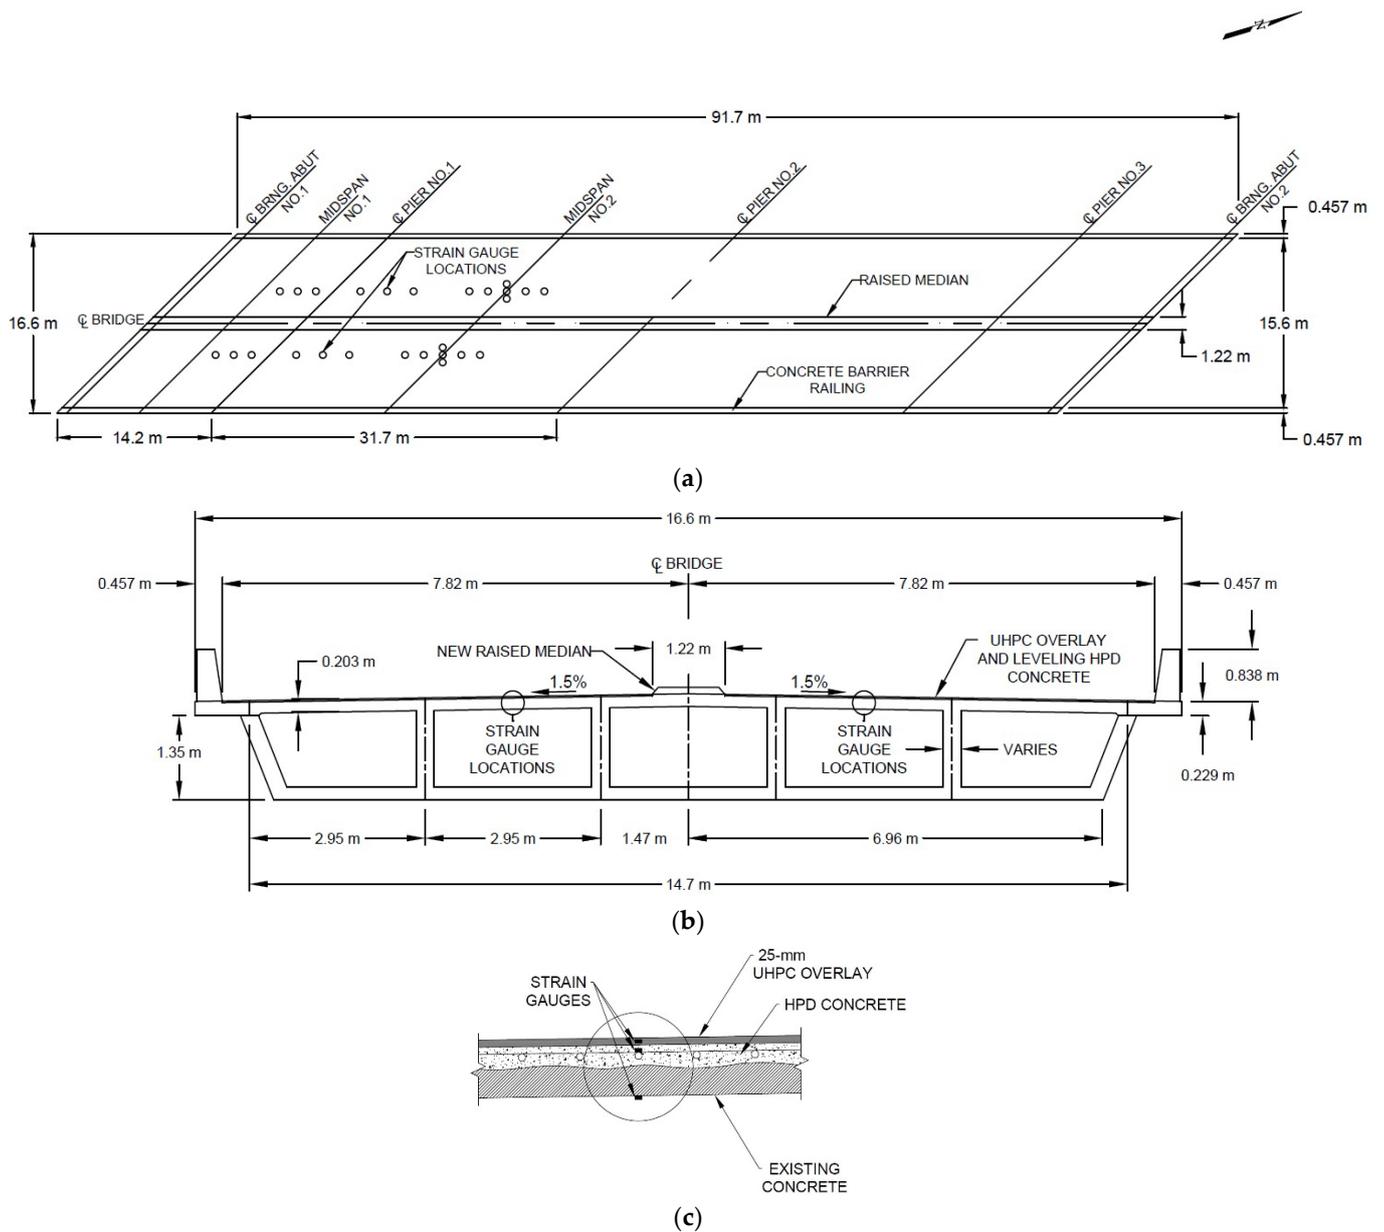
Bridge design layout with sensor instrumentation—(a) plan view; (b) cross-sectional view and (c) deck cross-sectional view.
